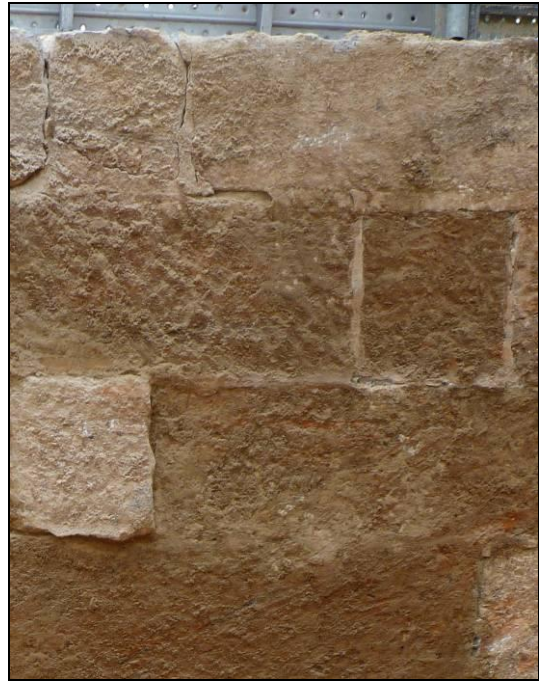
Sealing of cracks between dressed granite façade blocks
